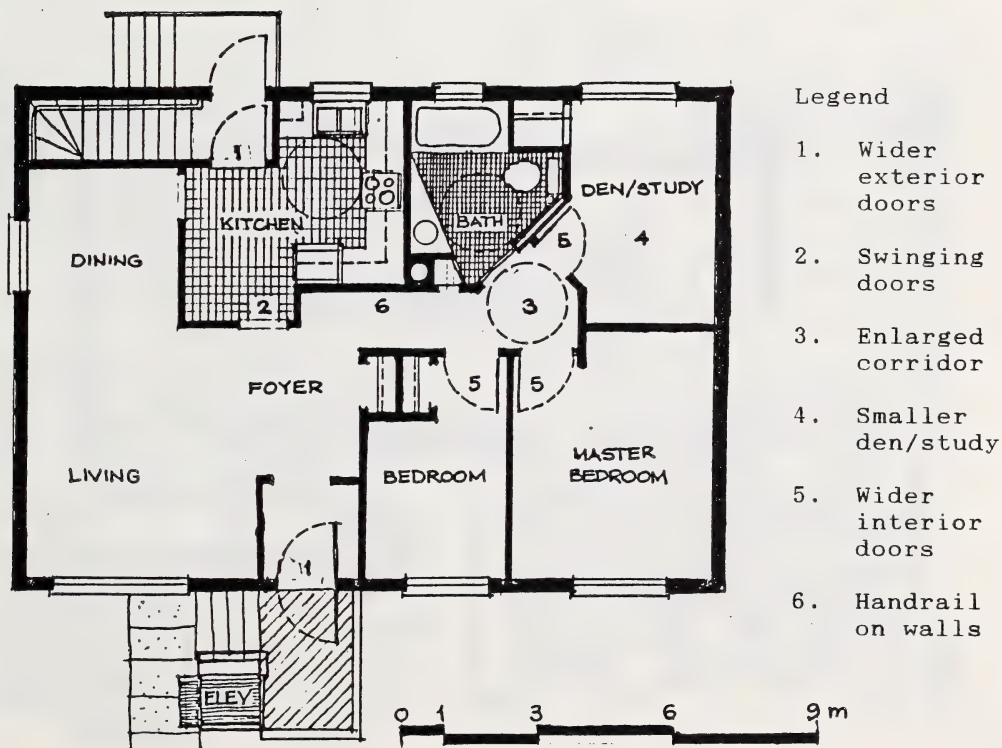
TYPICAL HOUSE PLAN RENOVATED FOR WHEELCHAIR ACCESS
